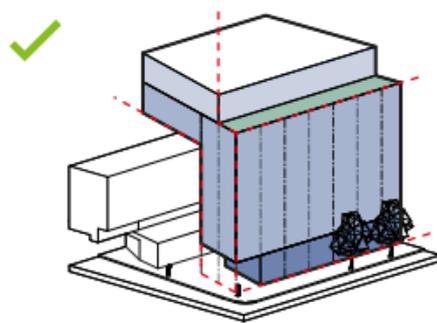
Acceptable: Northeast corner achieving public space through the maximum parameter (cantilevered recess)
